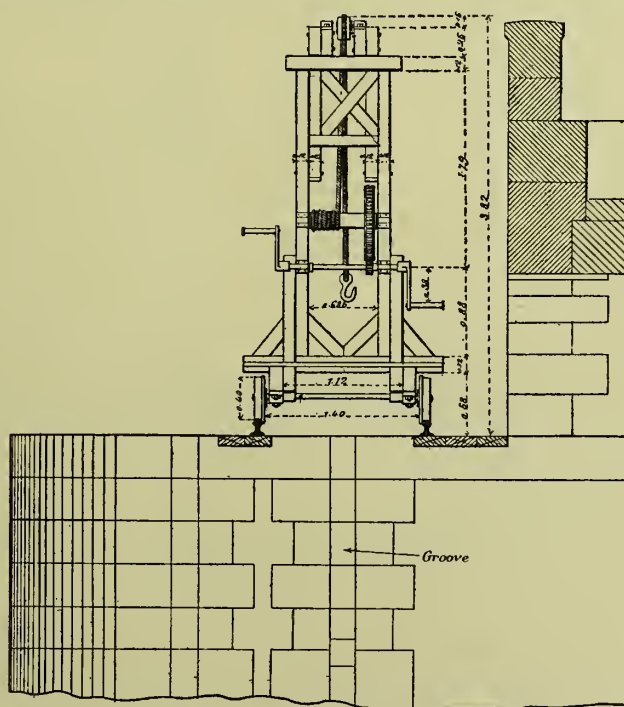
Travelling Carriage for Horizontal Sleepers. Side Elevation and Section
